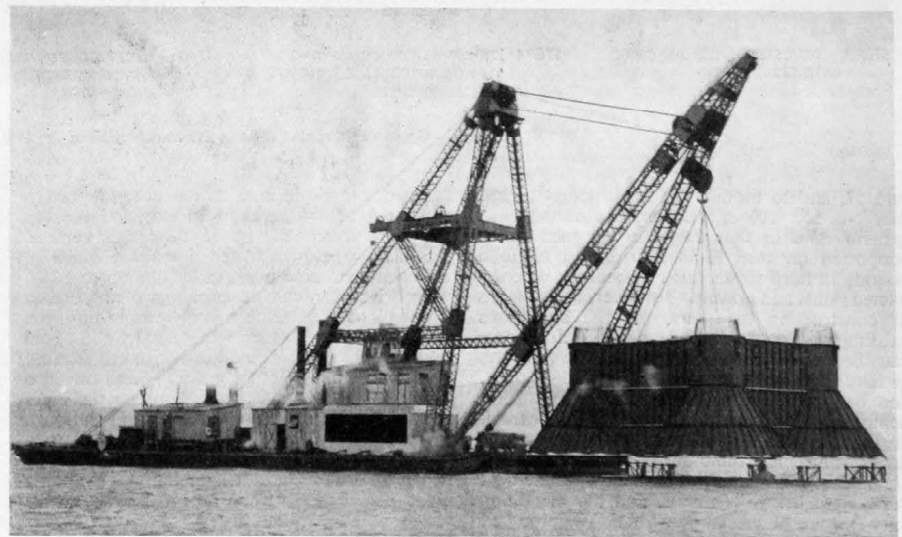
Floating derrick crane "Pacific Atlas" lowering one of the precast cone-diaphragm sections for pier No. 44
